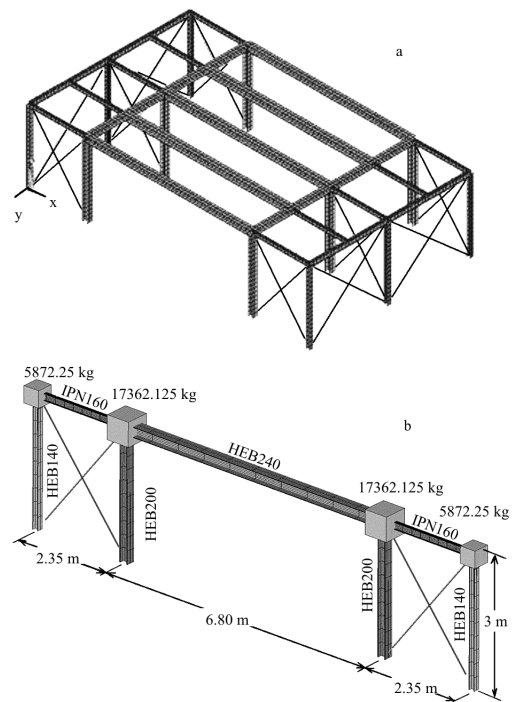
a – Beam structure for the garden section with the placement of SMA dampers. b – Schematic description of the garden central triple portico with H (vertical) and I (horizontal) steel elements, the loads and the SMA damper situation
